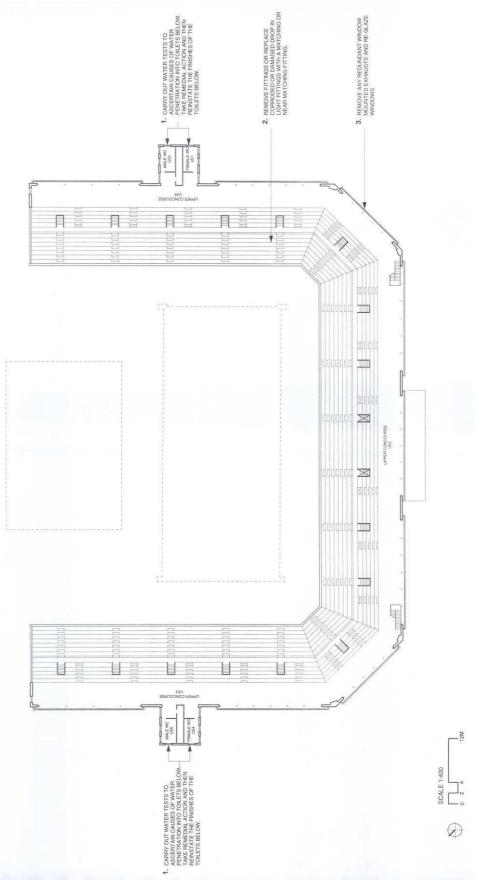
Beatty Park Leisure Centre – Upper Floor Plan (Conservation Works).
